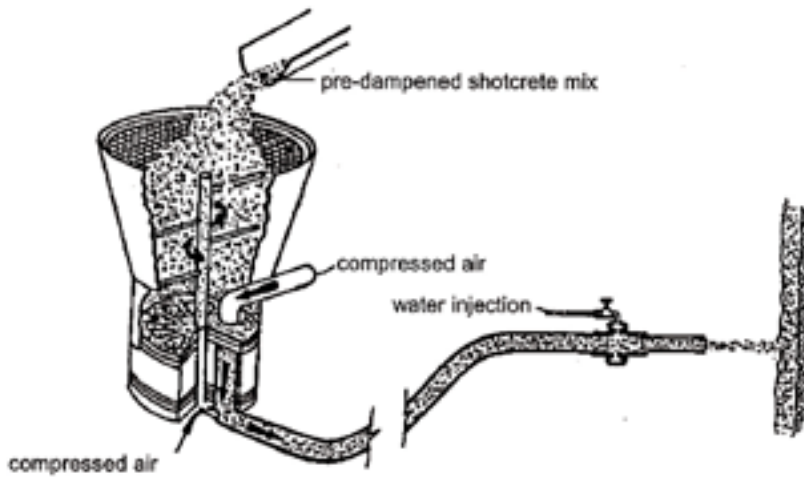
Simplified sketch of a dry mix shotcrete system /Hoek 2000/.
